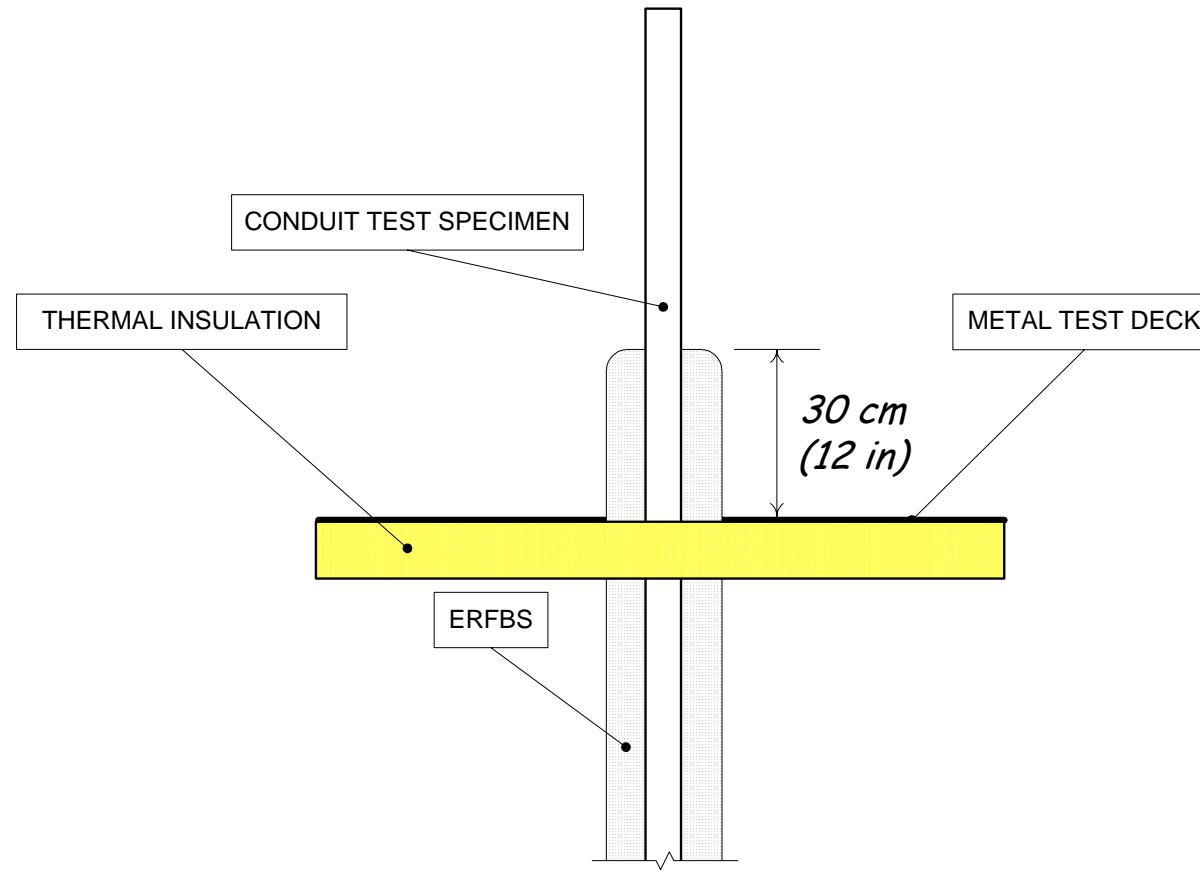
Detail of conduit test specimen direct attachment ERFBS extension through the test deck.
